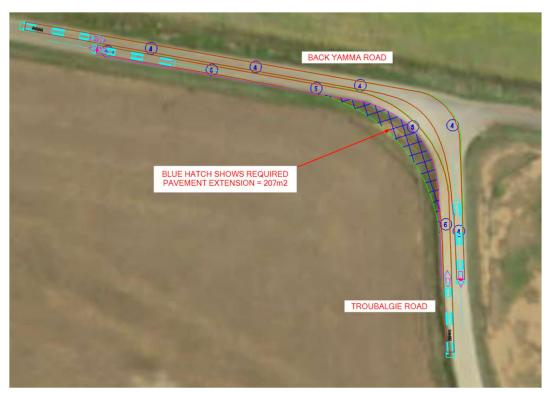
Swept path analysis - Back Yamma Road/Troubalgie Road priority intersection pavement extension requirements
